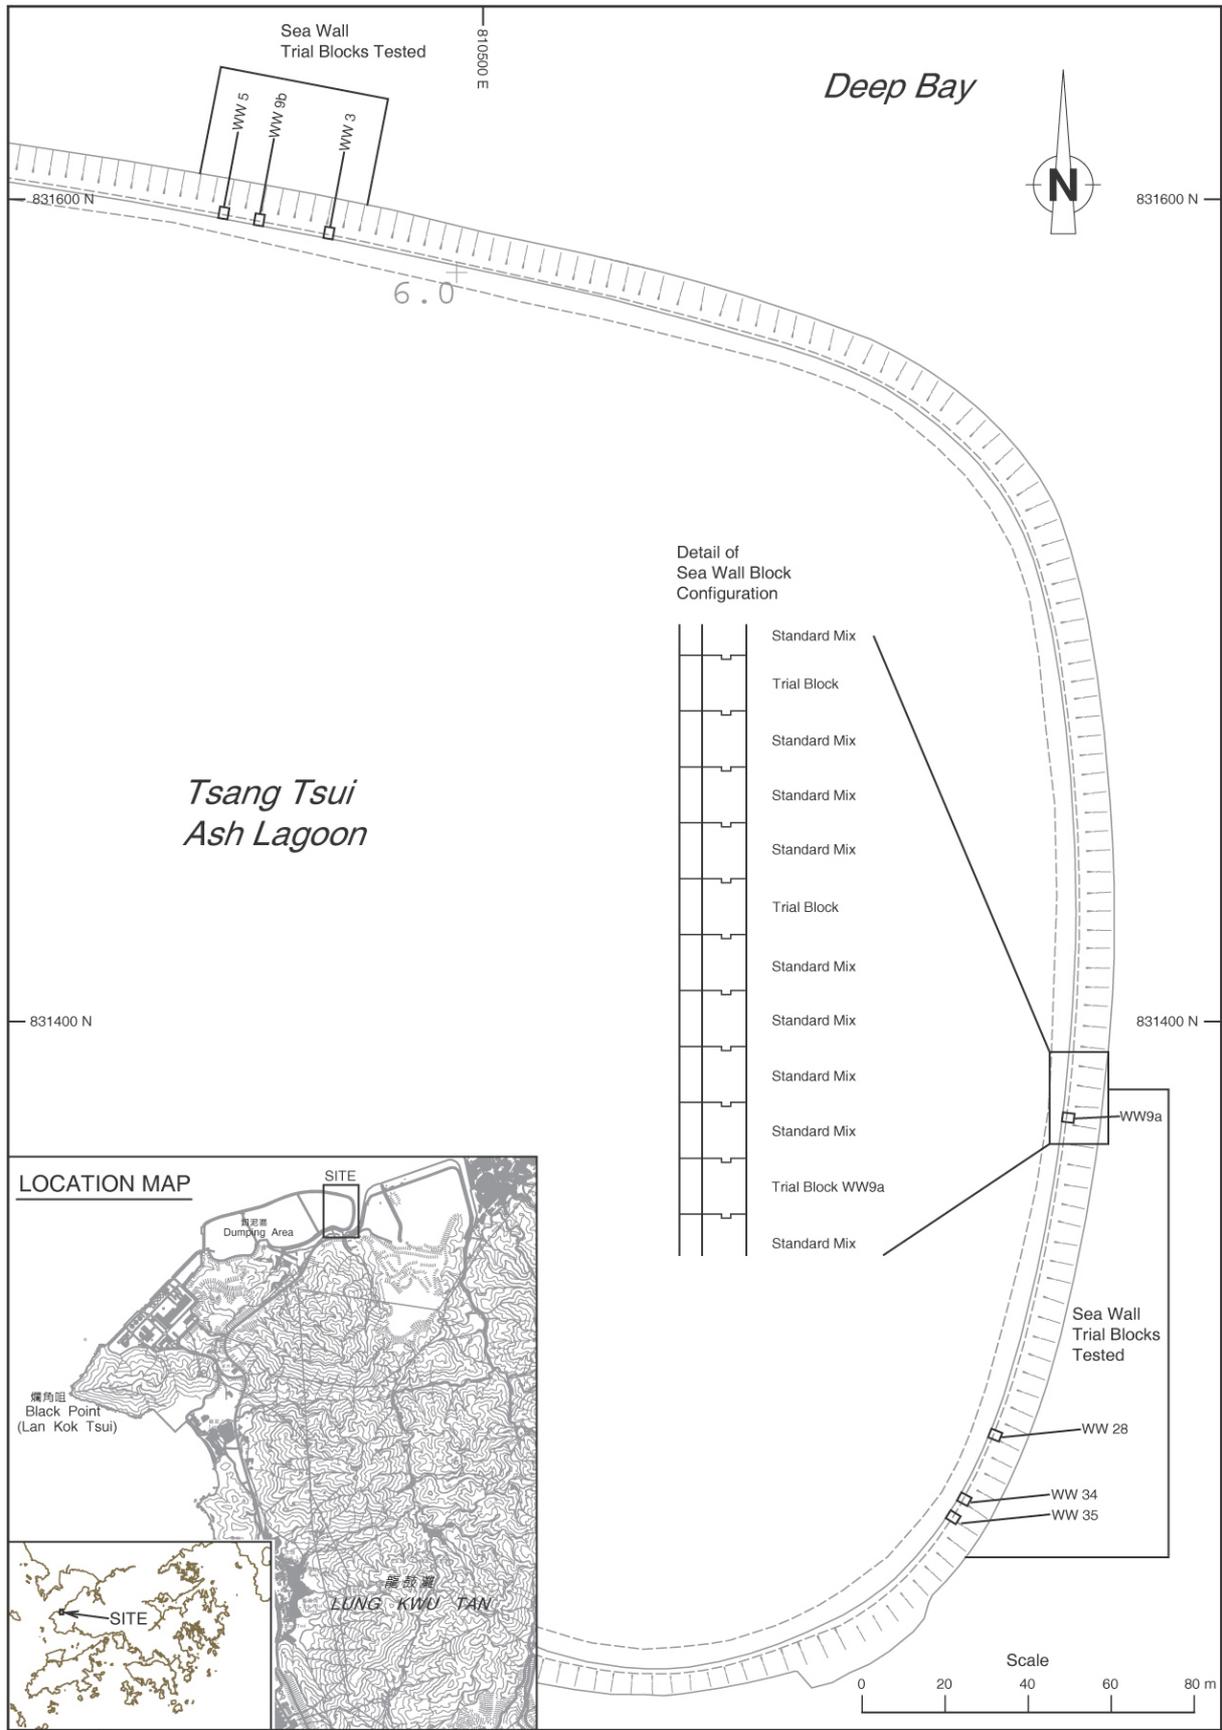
General Location of Tsang Tsui Ash Lagoons and Layout of Seawall Blocks
